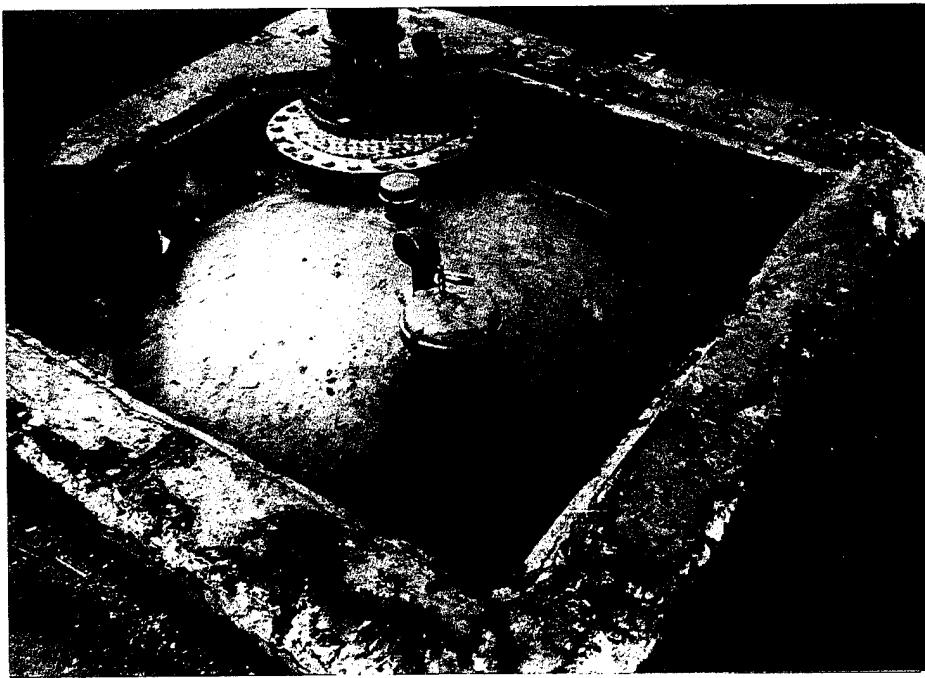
(AREE 3 - Compressor Condensate Drain). View East of Compressor Condensate Drainage System Outside Building 619.
